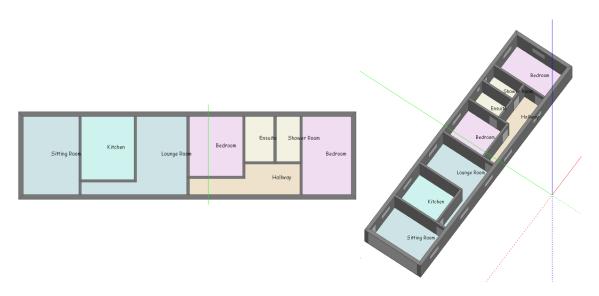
Floor plan of Semi-detached Model (and view with doors and windows)
